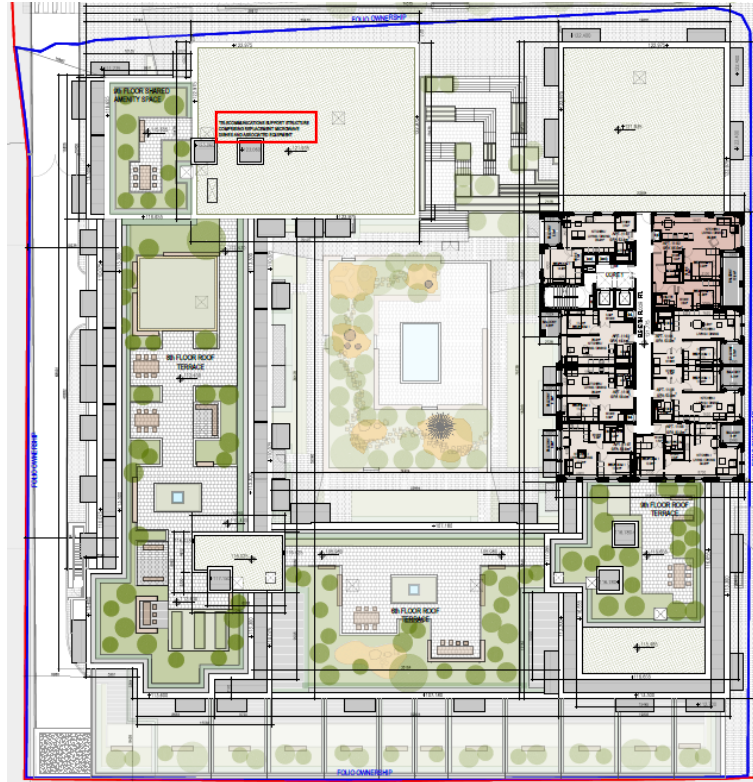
Eleventh floor plan. We note the provision of telecommunications equipment at this level, see annotation inside red outline. 7 no. one-bedroom apartments and 1 no. two-bedroom apartment are provided at this level.
